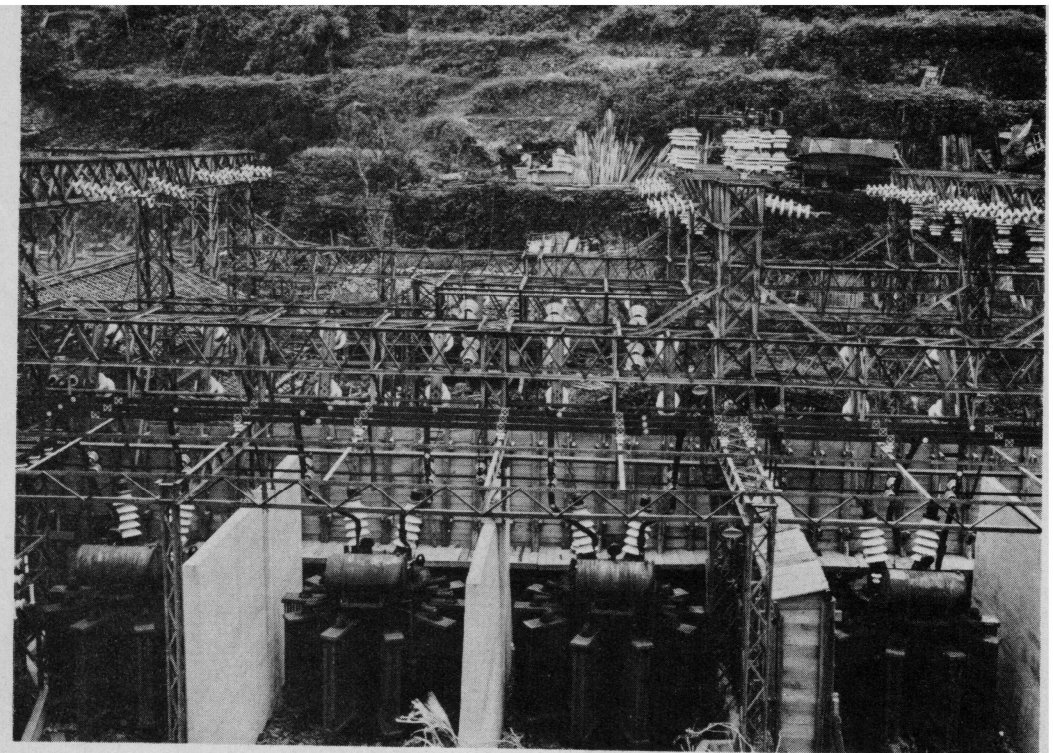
Reinforced-concrete blast walls protecting transformers (1 mile from ground zero at Nagasaki).
